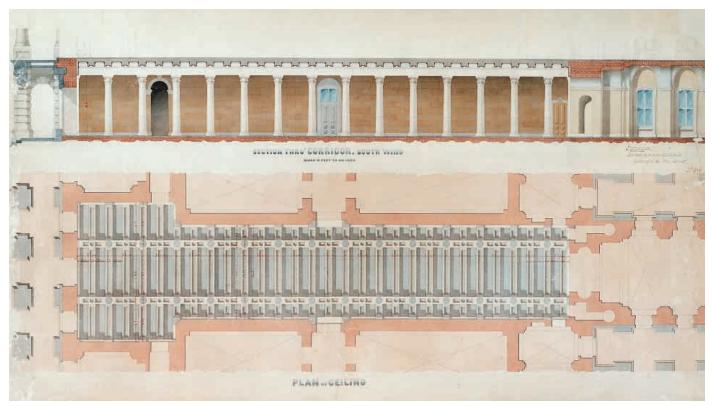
Thomas U. Walter, Section Thro' Corridor. South Wing with Plan of Ceiling, 1855. Running the full width of the House wing on the first floor is the so-called Hall of Columns. Twenty-eight columns made of Lee, Massachusetts, marble were designed by Walter with thistle and tobacco along with the conventional acanthus in an American variation of the Corinthian order. Architect of the Capitol.
